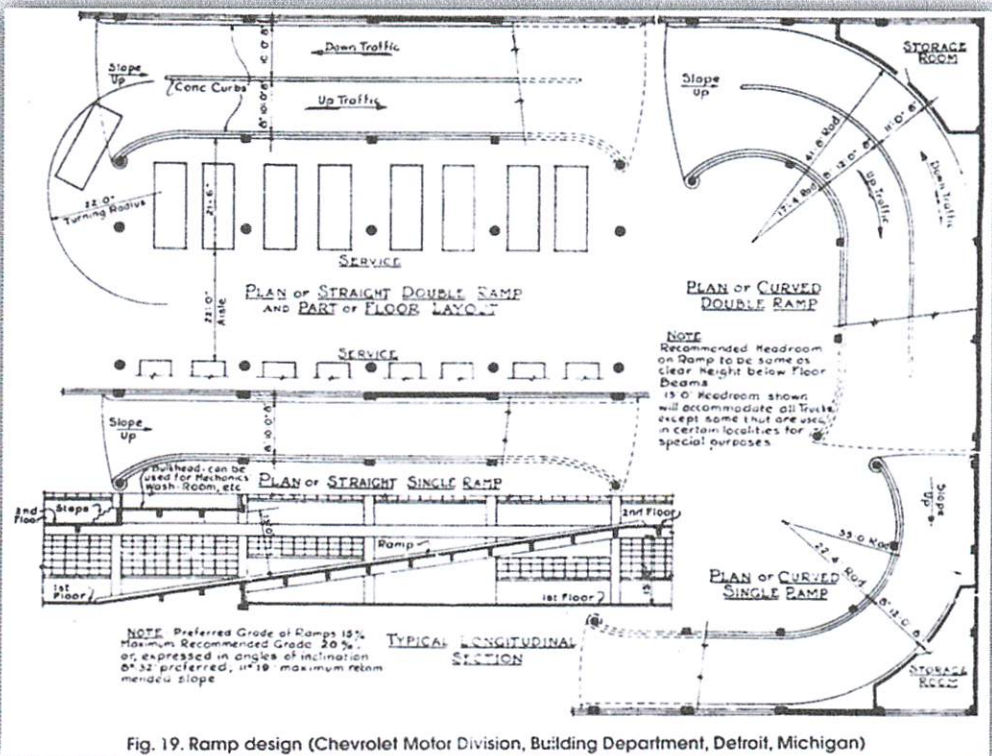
Ramp design (Chevrolet Motor Division, Building Department, Detroit, Michigan)
